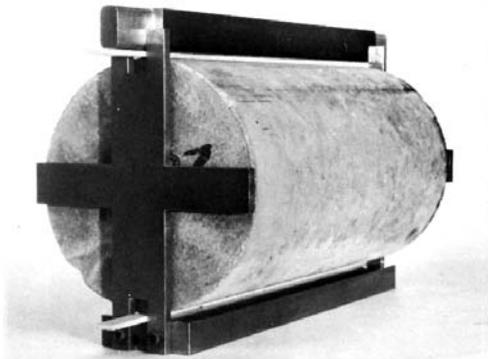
Jig for Aligning Concrete Cylinder and Bearing Strips
